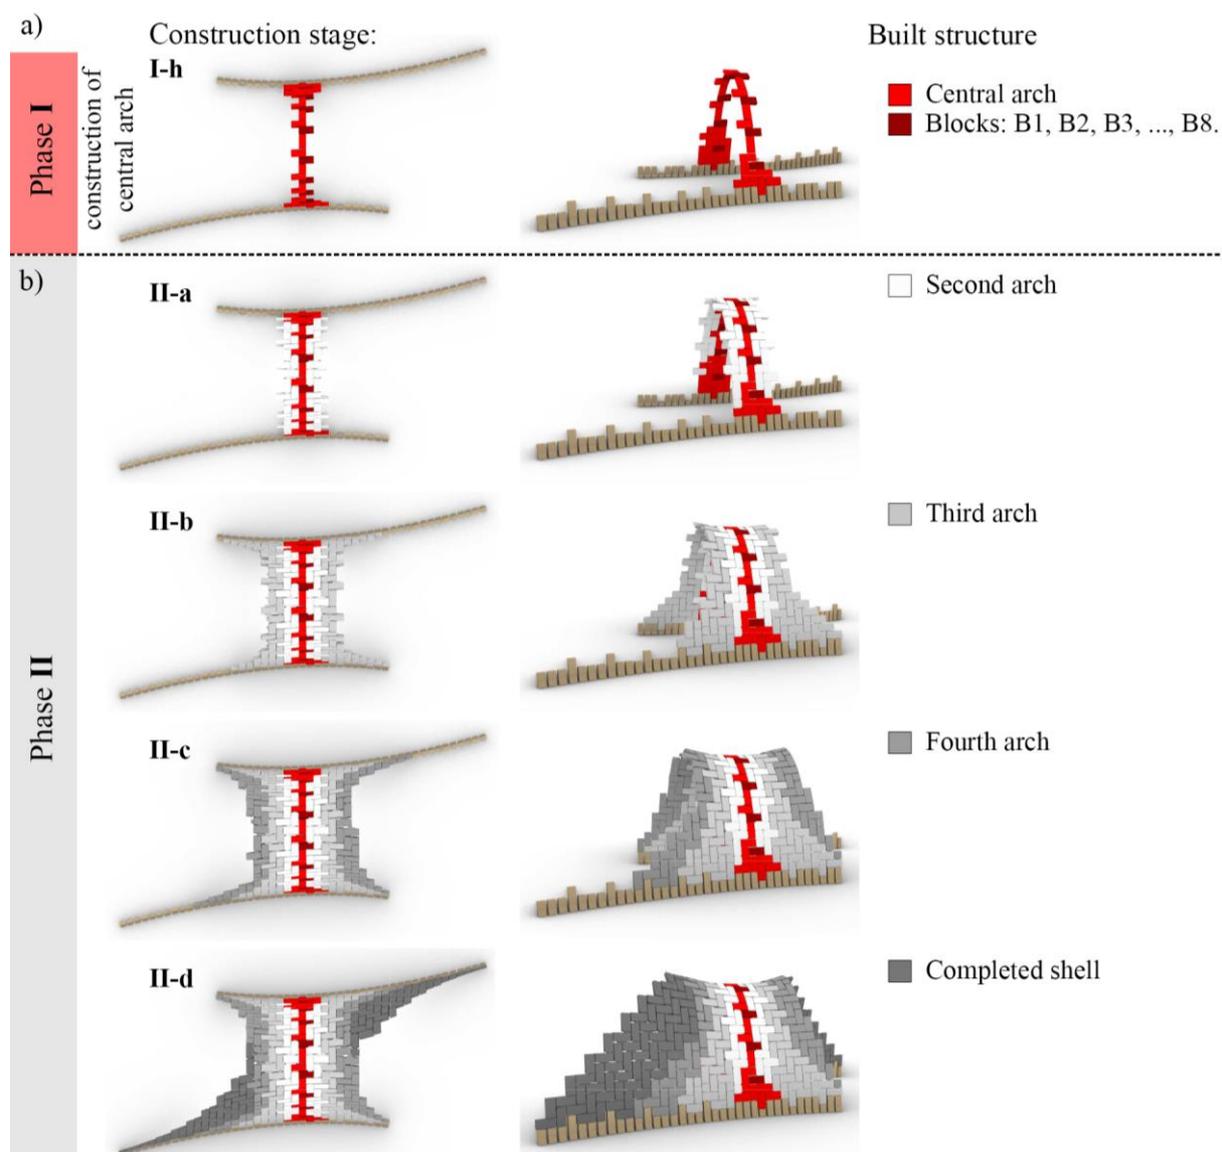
Construction process for the masonry vault. a) Final stage of phase I and the closing of the central arch (construction stage I-h) b) phase II, where each stage is defined by the construction of a new inclined arch substructure.
